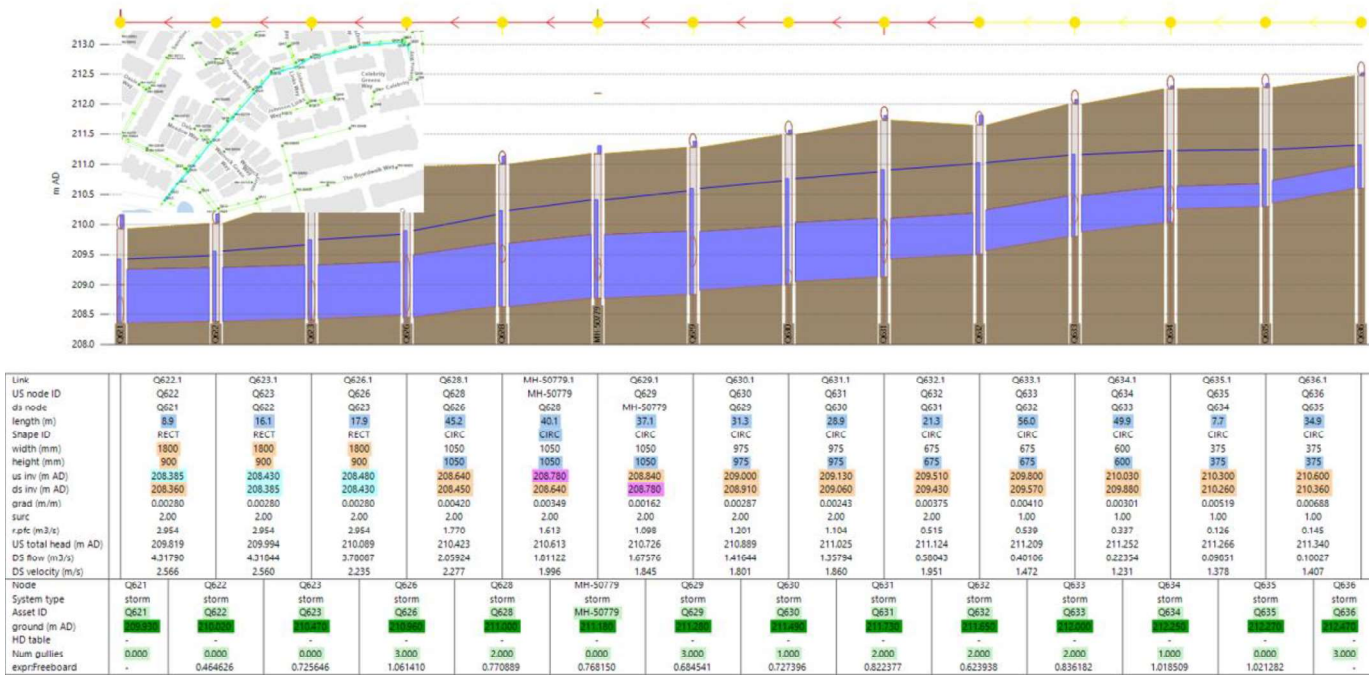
100 Yr HGL level – Pipes Upstream to East Pond North Inlet – Raising the Overflow Weir
